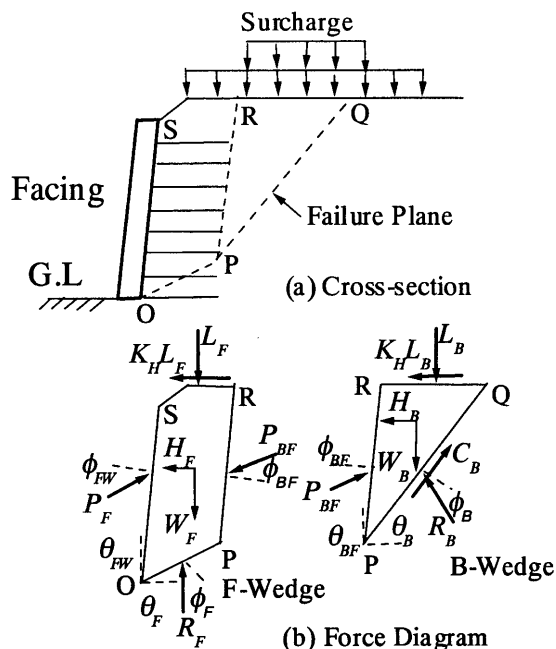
Two wedge failure mechanism assumed in current seismic design of reinforced-soil retaining walls with rigid full-height facing (after Horii et al., 1994)
